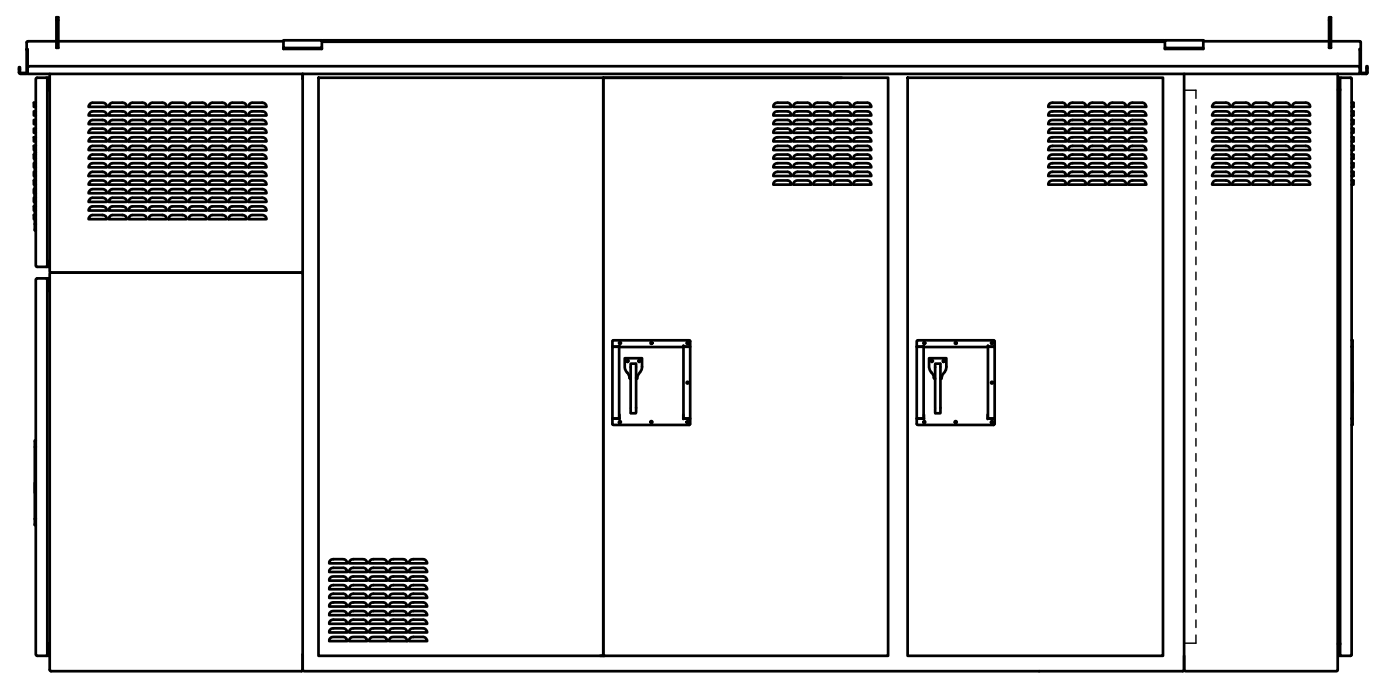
KIOSK - ROOF (TYP.)
